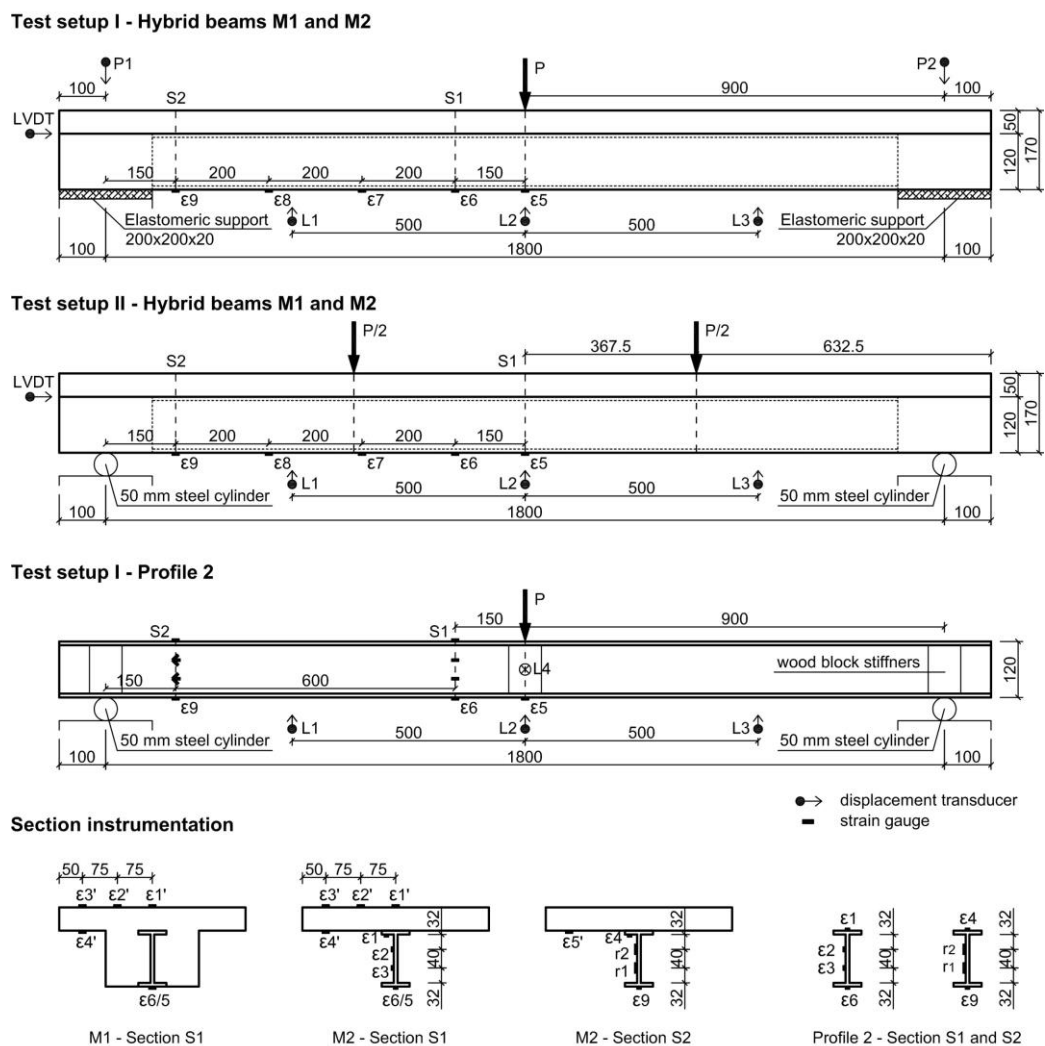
Schematic of load arrangements and instrumentation of tested specimens (mm).
